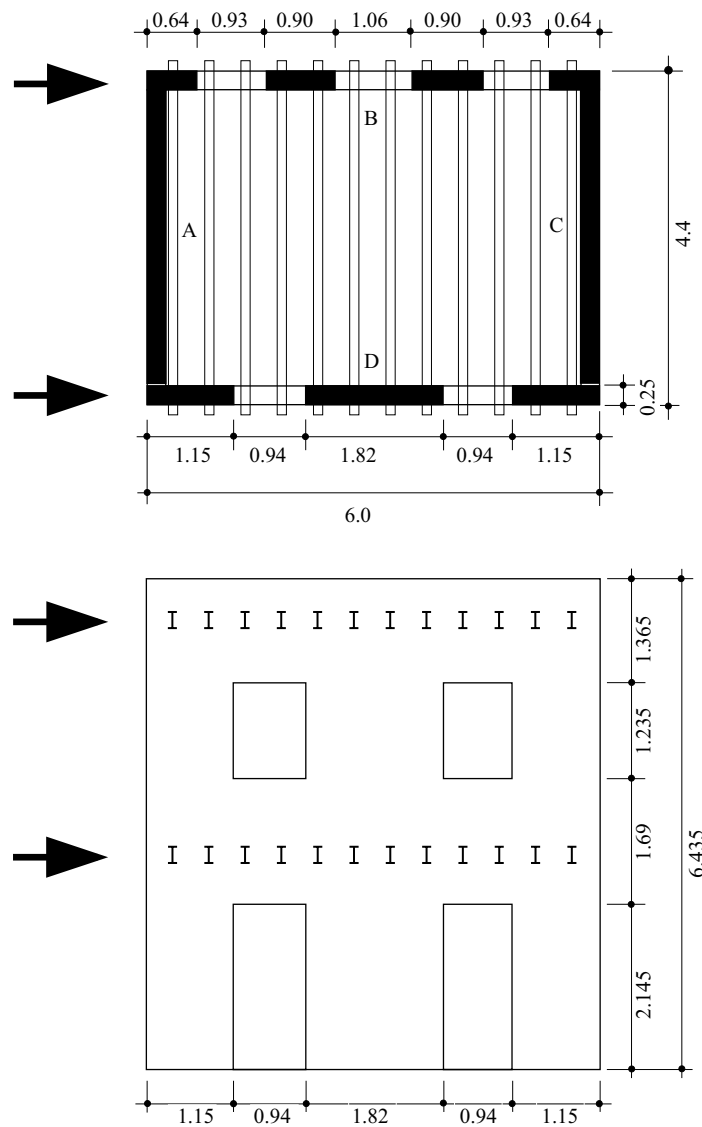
Plan and elevation of the model building tested under cyclic static action at the University of Pavia + points of application and direction of seismic forces [MKC 95], dimensions in m
